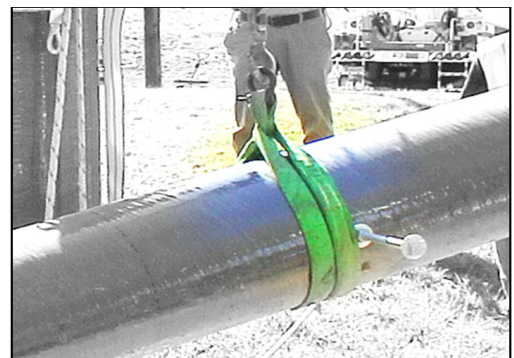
A short lifting sling installed below a step bolt will prevent slippage.
